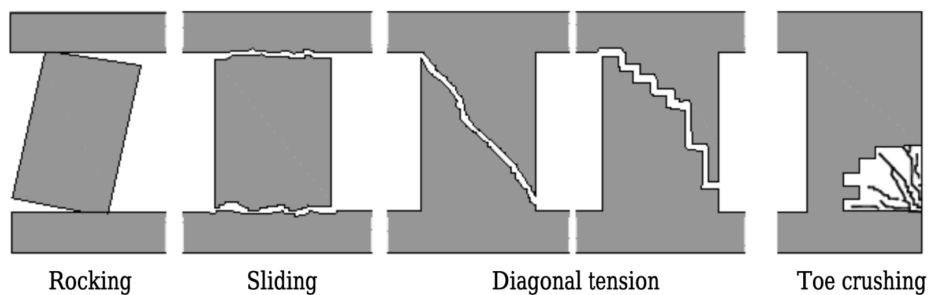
Failure modes of masonry piers (a) Rocking (b) Sliding shear failure (c) Diagonal tension cracking (d) Toe crushing
